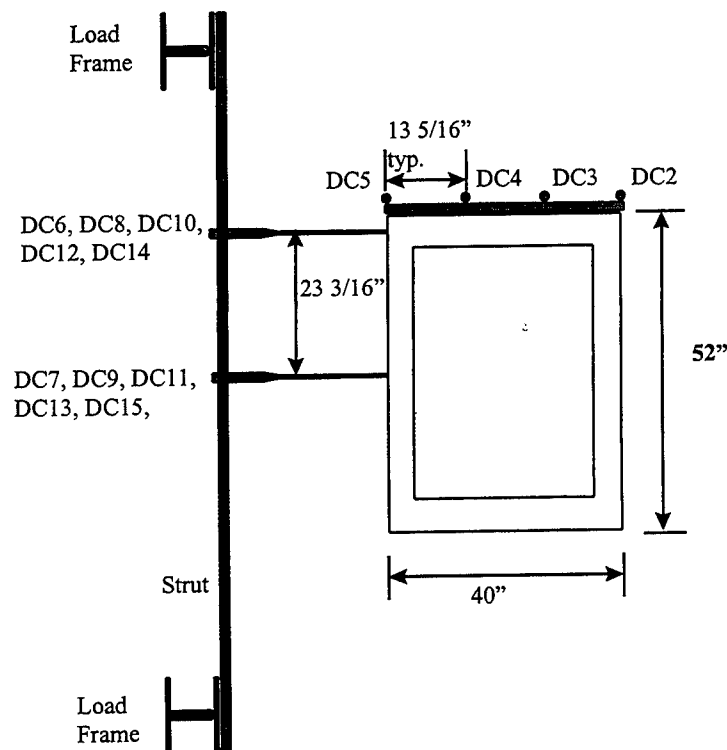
Plan view of deflection gage locations on ITS-2 and ITS-3 structures.
